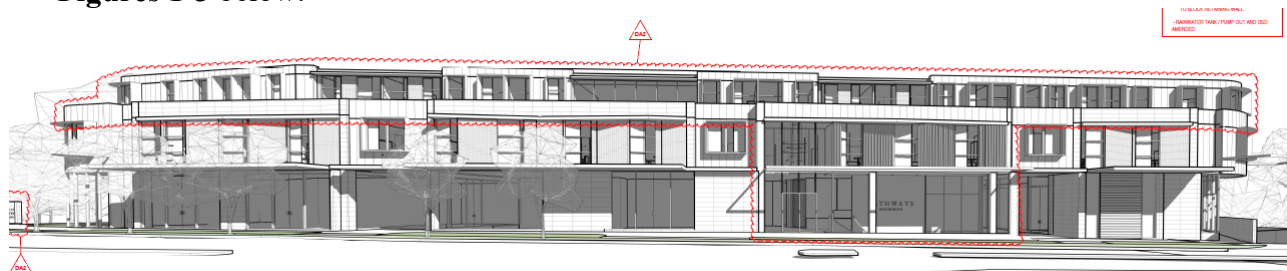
Pedestrian view – Kenneth Street looking east (Source: Drawing DA503, Revision DA2, MDP Architects)
